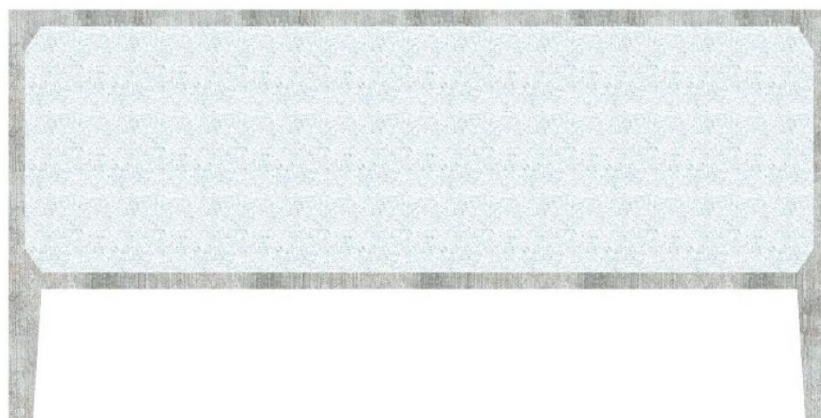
Cross section of a single breakwater pontoon. © by Clement Germany GmbH.
